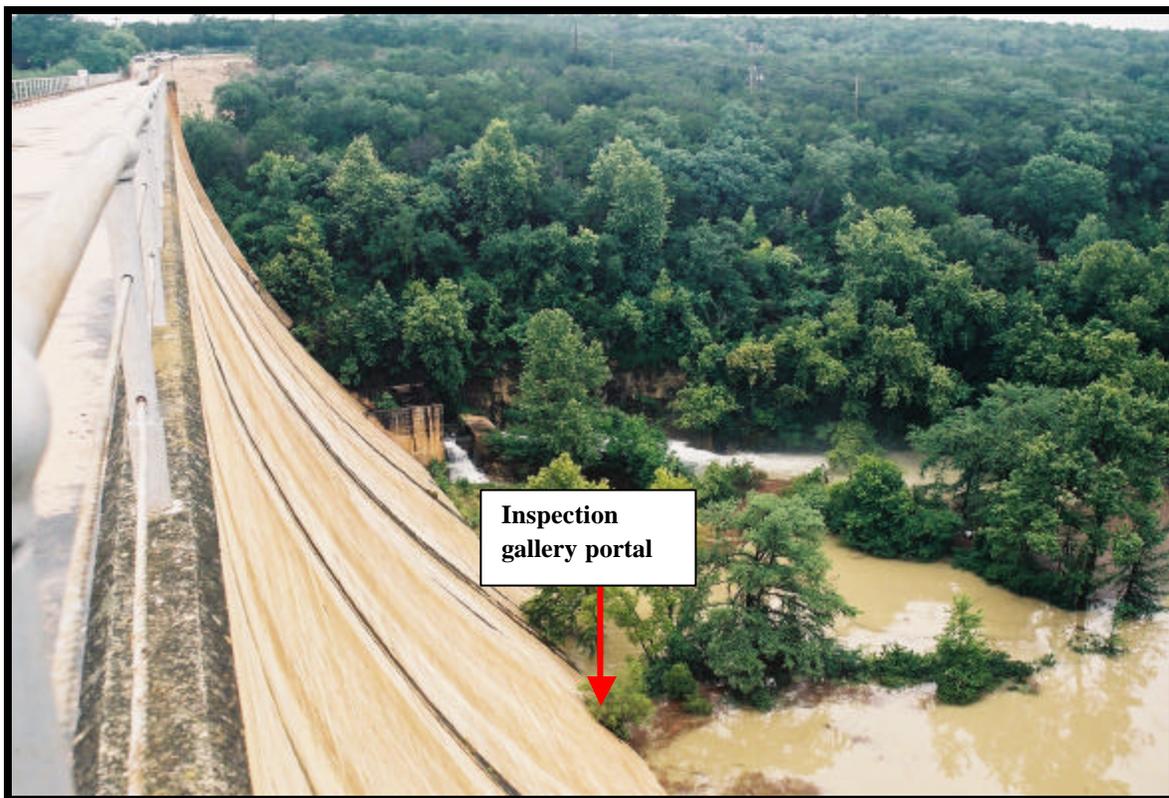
View of left abutment and crest of concrete gravity section, looking right. (Friday, July 5<sup>th</sup>)
